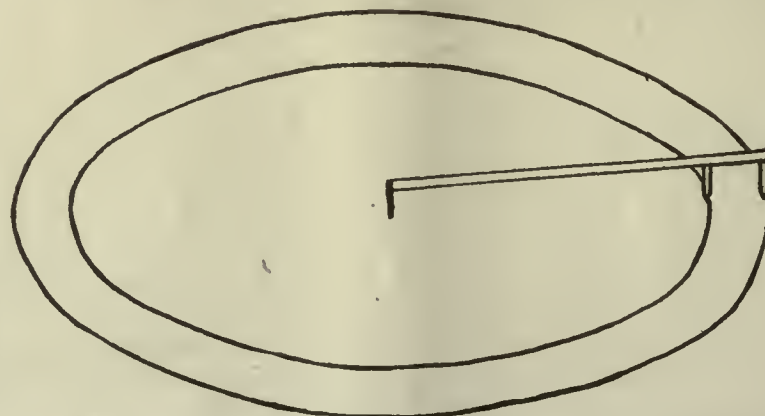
Marking the Circumference of a Pit Silo Before Digging Trench for Concrete Curbing.
